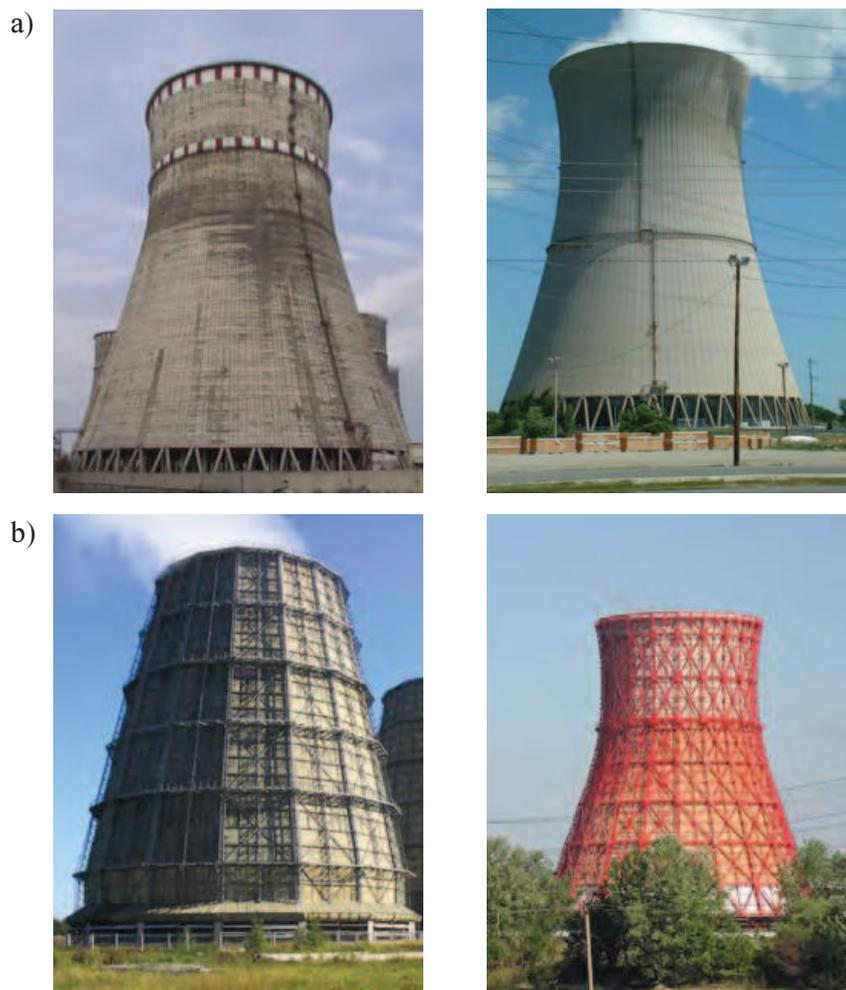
Cooling towers: a) reinforced concrete, b) metal
